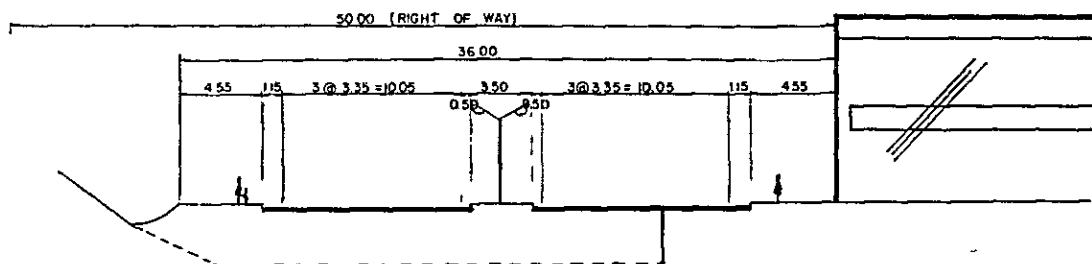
WIDENED CROSS SECTION OF VIA CERRO ANCON(2)
